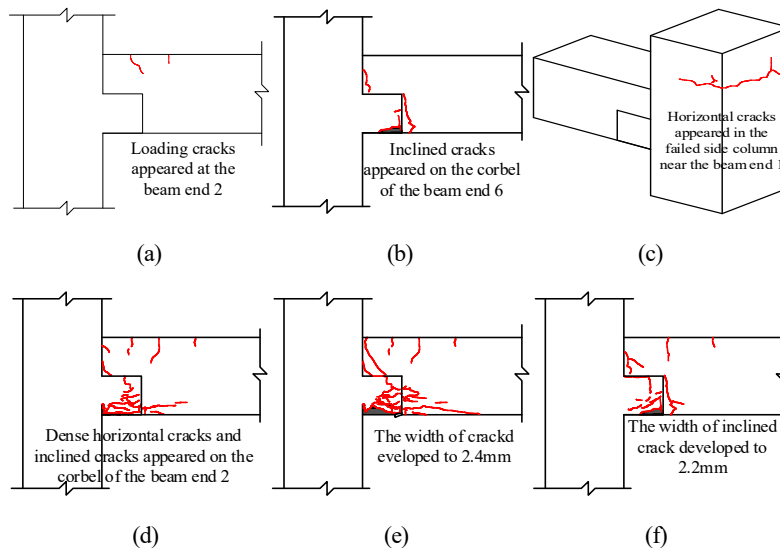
Concrete cracks development: (a) The beam end 2 (16 mm); (b) the beam end 6 (24 mm); (c) the beam end 1 (40 mm); (d) the beam end 2 (80 mm); (e) the beam end 2 (150 mm); (f) the beam end 6 (150 mm).
